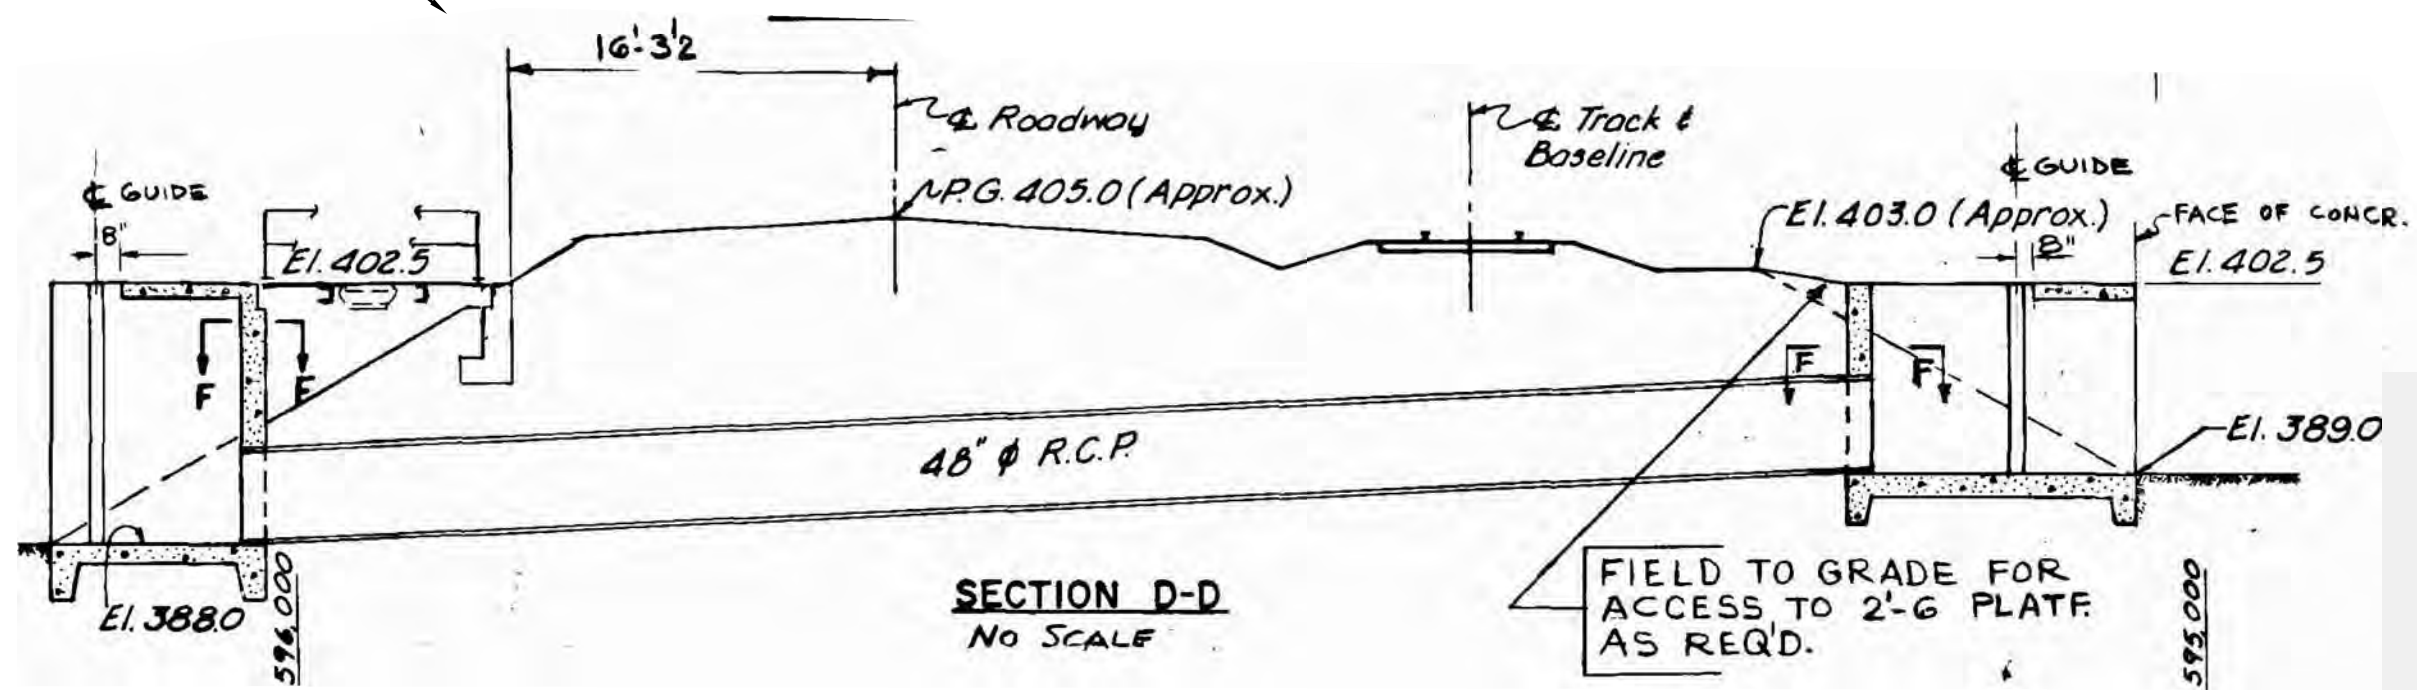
IMAGE REFERENCE: BIG RIVERS RECC, SITE PLAN SHOWING ASH DISPOSAL DYKES DRAINAGE STRUCTURES & DITCHES, DRAWING NO. 3820-C1-3 REV. 6 - FINAL AS BUILT, FEBRUARY 12, 1971.
